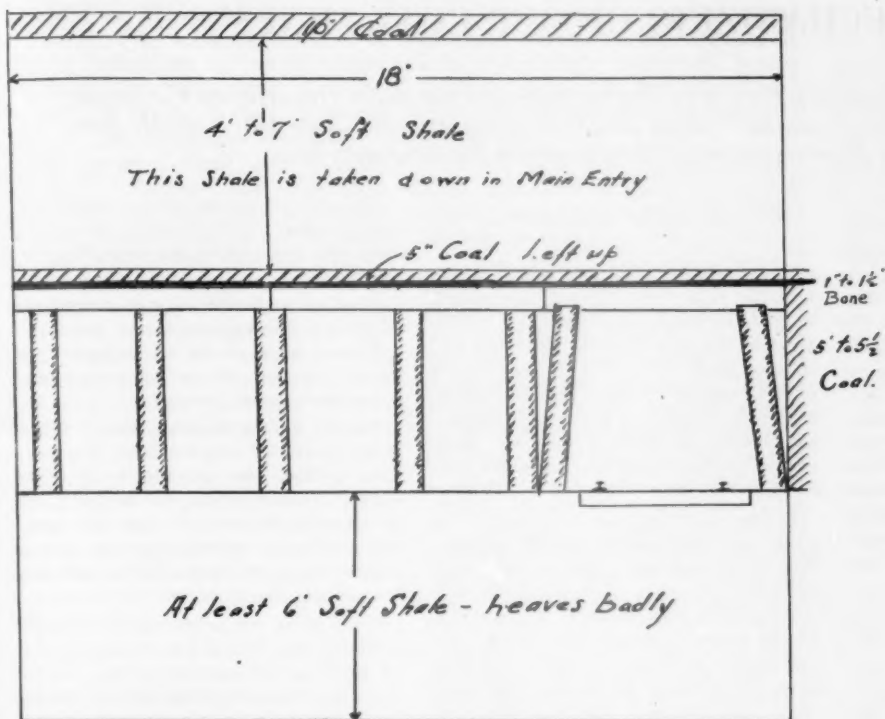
Cross section of room, Sugarite Mine. Sets spaced three foot centers
